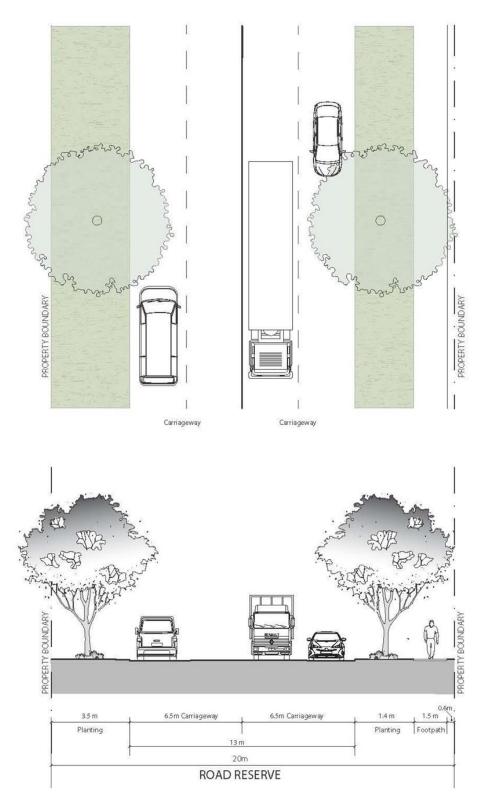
B: Employment Land Street with Footpath (Road Section B as per Figure 3)
